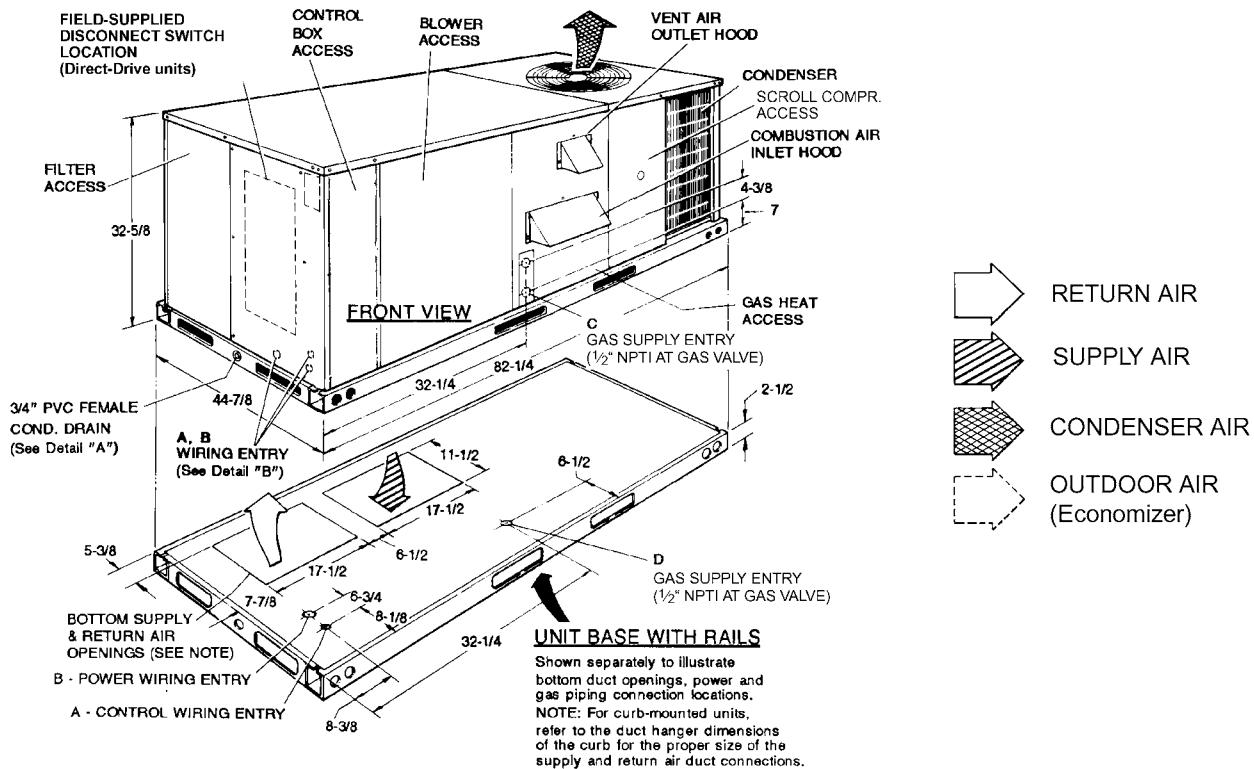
UNIT DIMENSIONS (3 - 6 TON COOLING/GAS HEAT) FRONT VIEW
